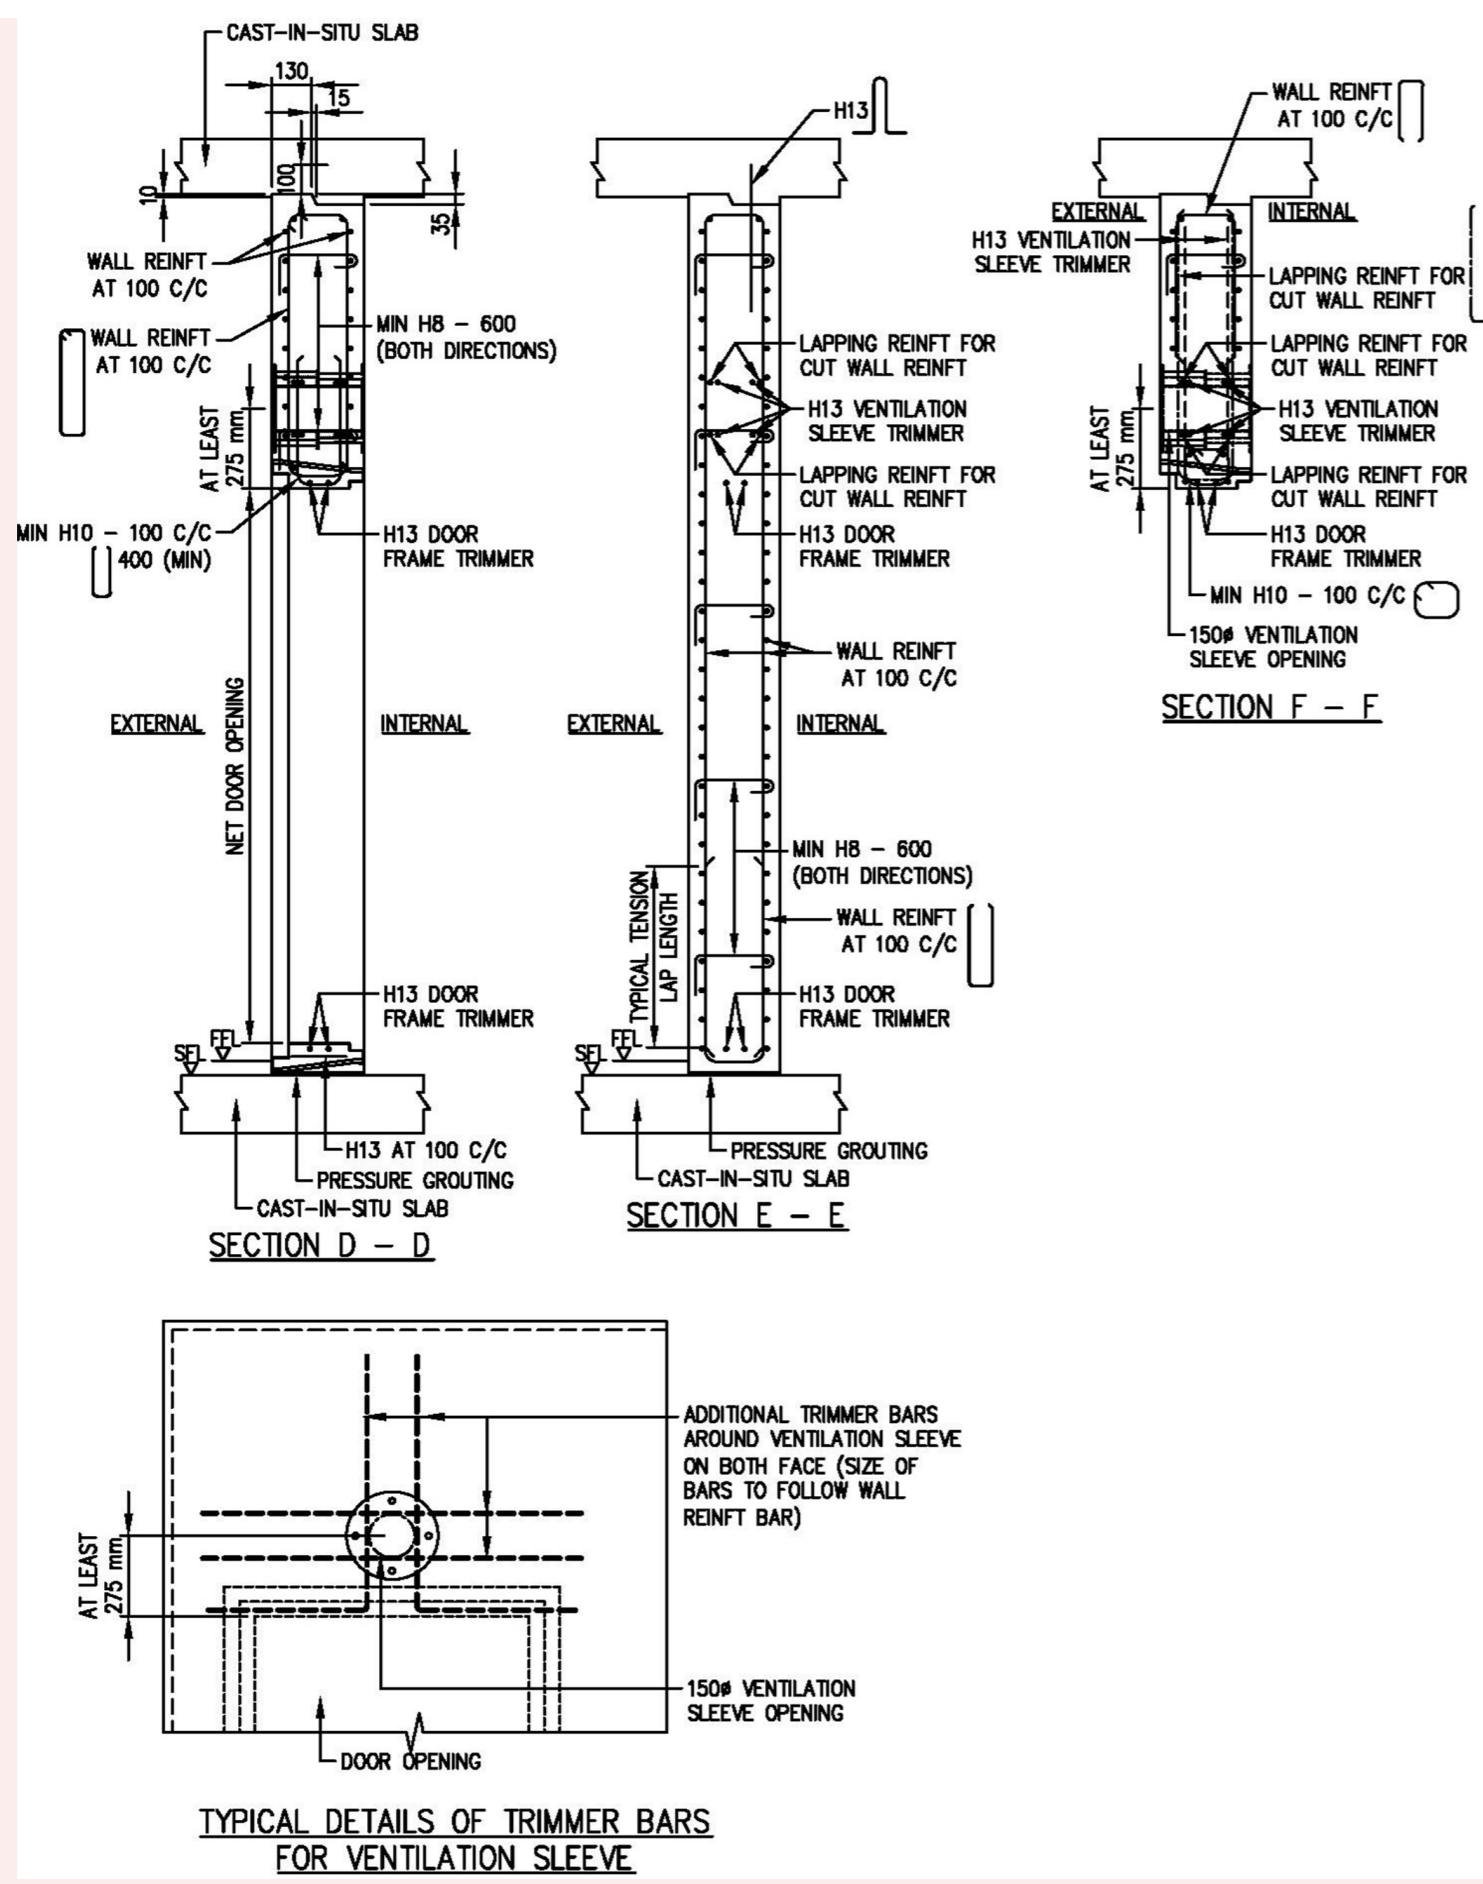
(i): DETAILS AND SECTIONS OF PRECAST SS DOOR FRAME PANEL WITH VENTILATION SLEEVE ALONG ITS SIDE (TYPE 2)
